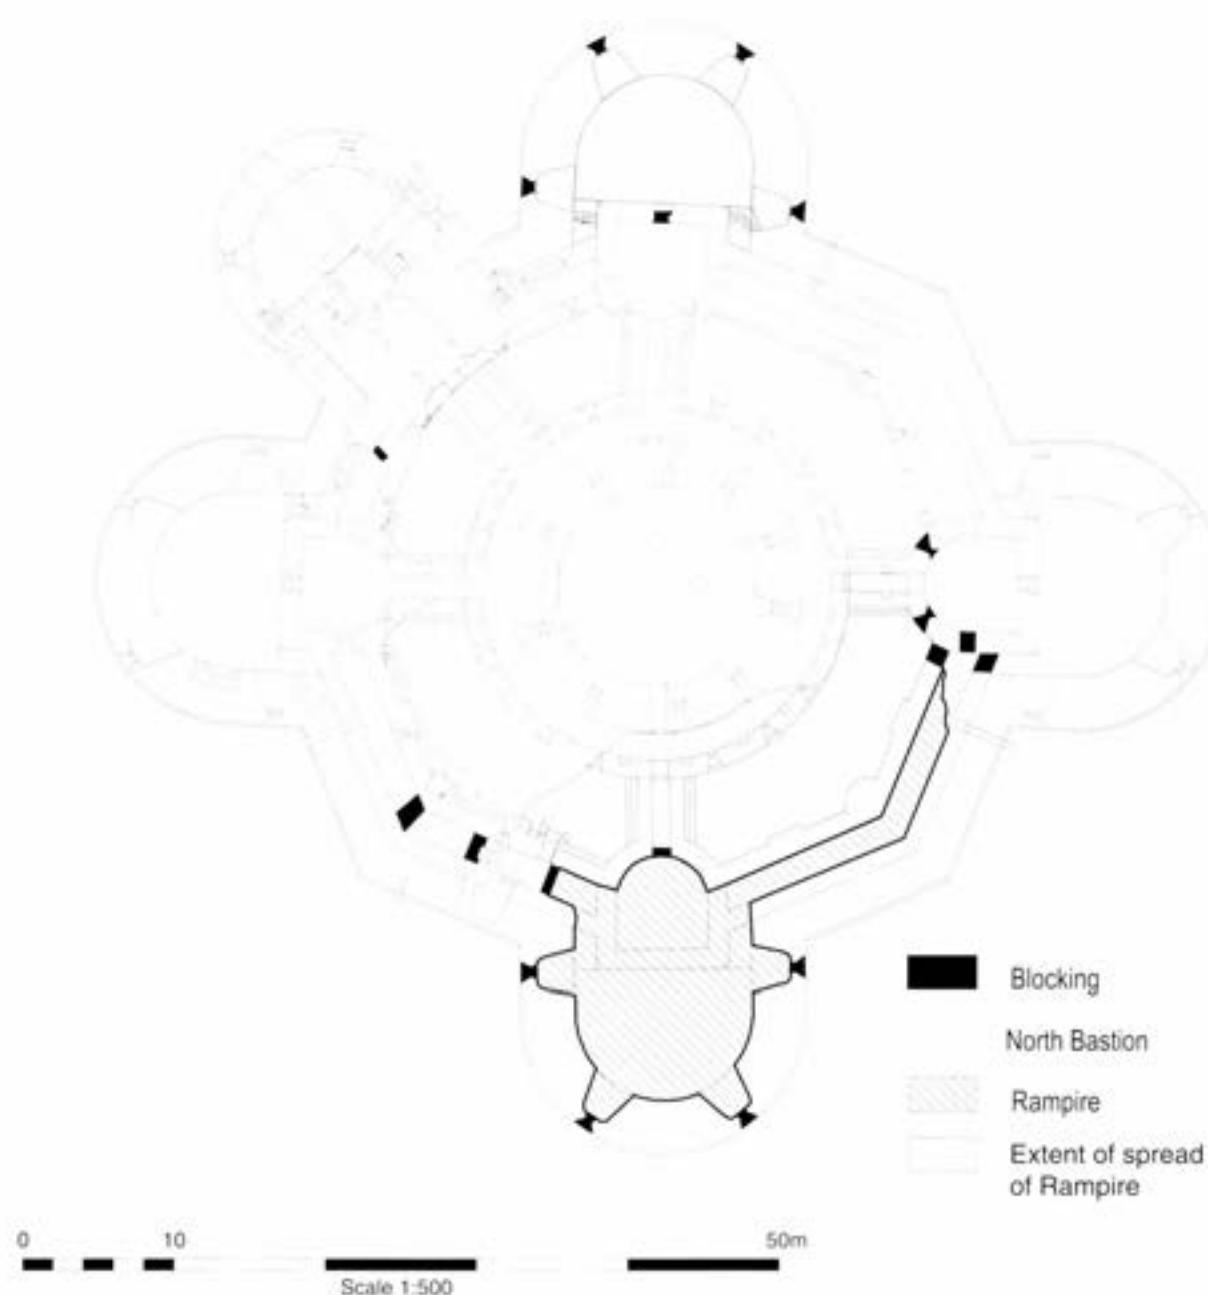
The phase IVb castle: plan showing the extent of the Rampire, and blockings
